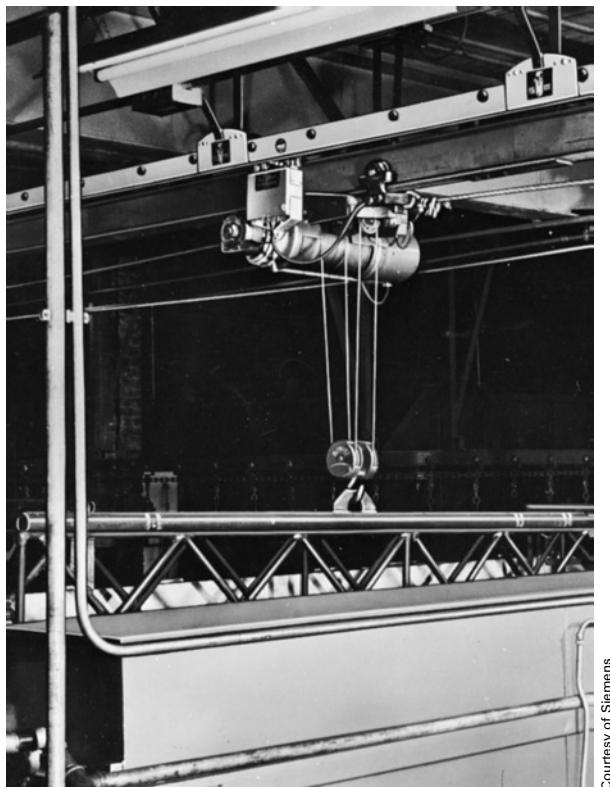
Trolley busway may be used to feed power to hoisting equipment.
